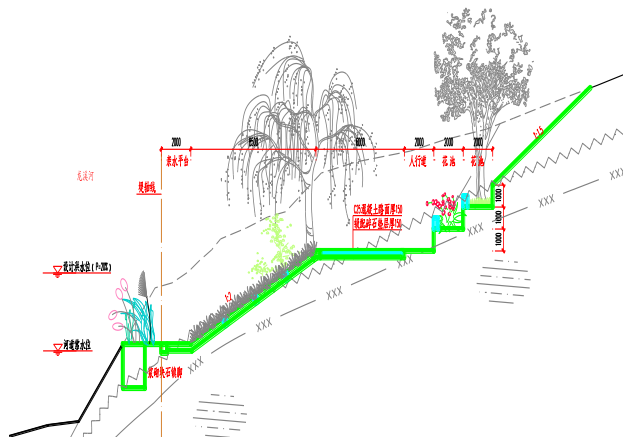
Proposed Cross Section of Longxi River (Dianjiang Section)
